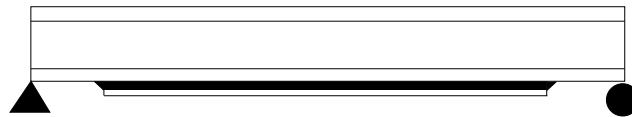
Simply Supported Girder with a Welded Cover Plate
